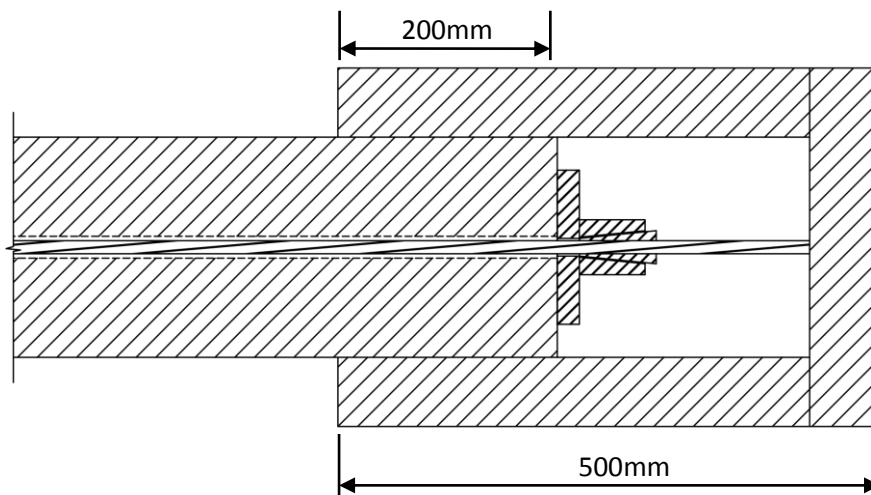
LVL timber protected post-tensioning anchorage, longitudinal section.
